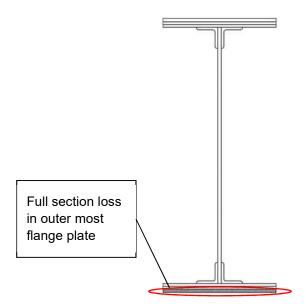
Mulbary Drain - Outer Girder - Section Loss Considered
